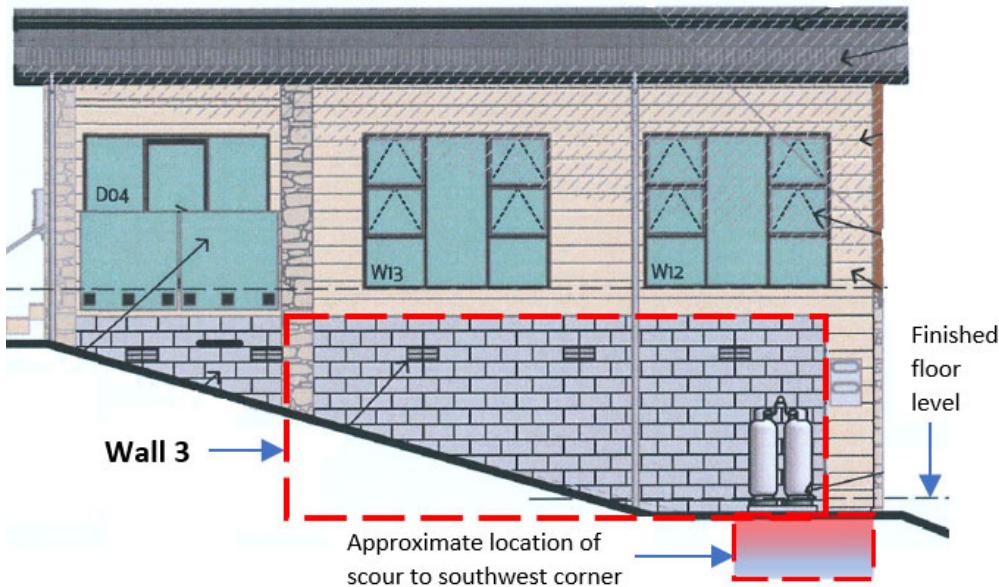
West elevation of 307A Lakes Boulevard (not to scale)¹¹⁷
